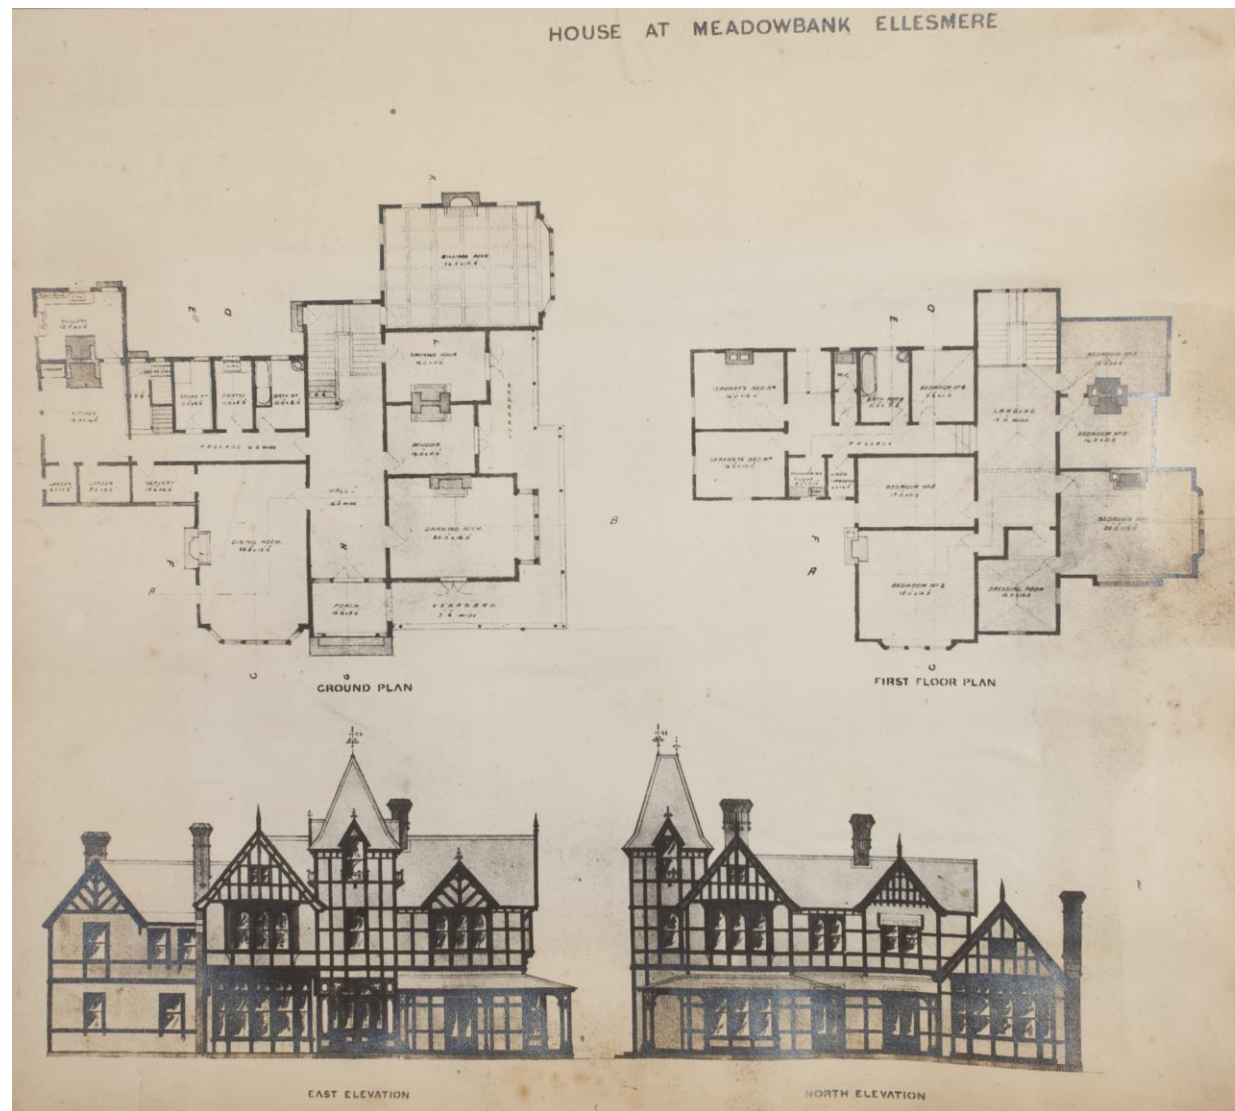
Collins and Harman, Meadowbank, Ellesmere, plans and elevations (1891).
